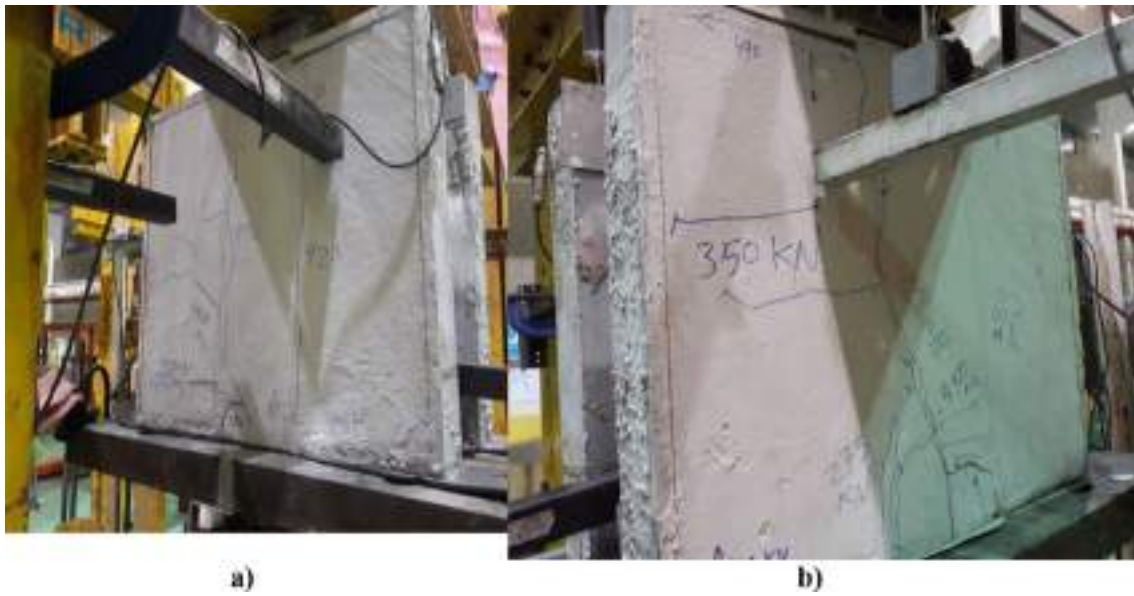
Longitudinal and transverse cracks of B-B specimens
